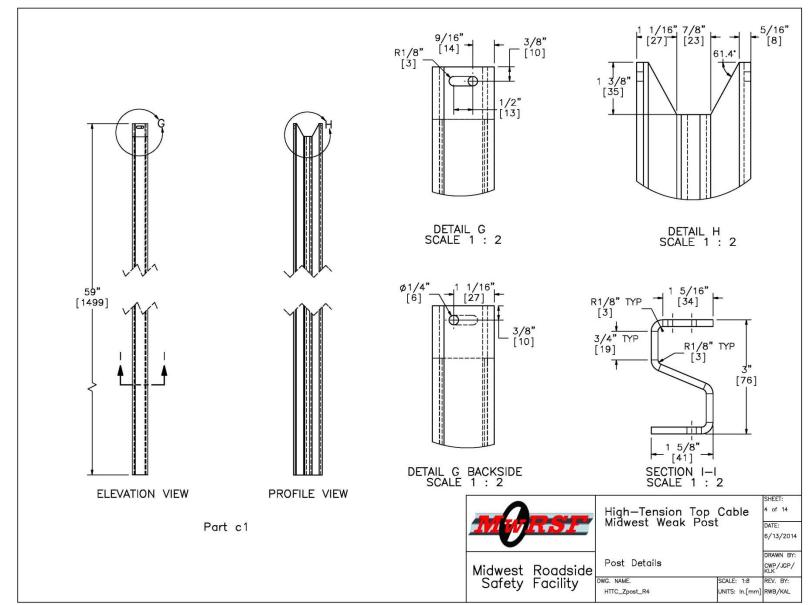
Midwest Weak Post Details, Test No. HTTC-2
